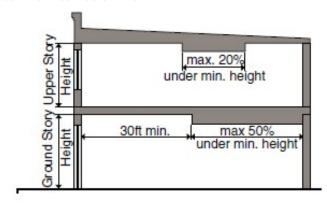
MEASURING GROUND FLOOR ELEVATION
